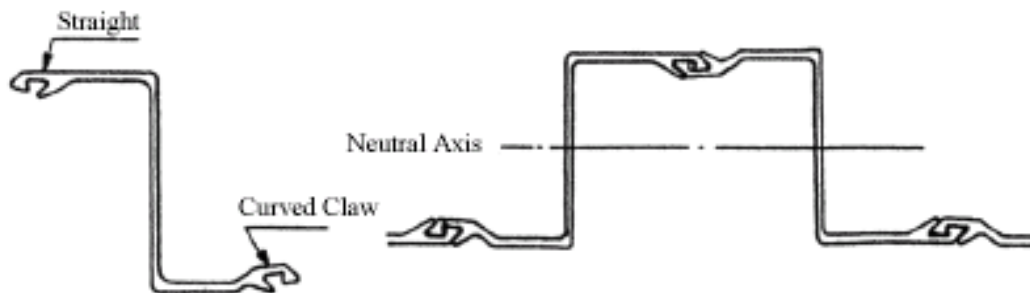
Typical configuration of Z-shaped steel sheet pile sections (website of Atlantic Sheet Pile, Inc.)
